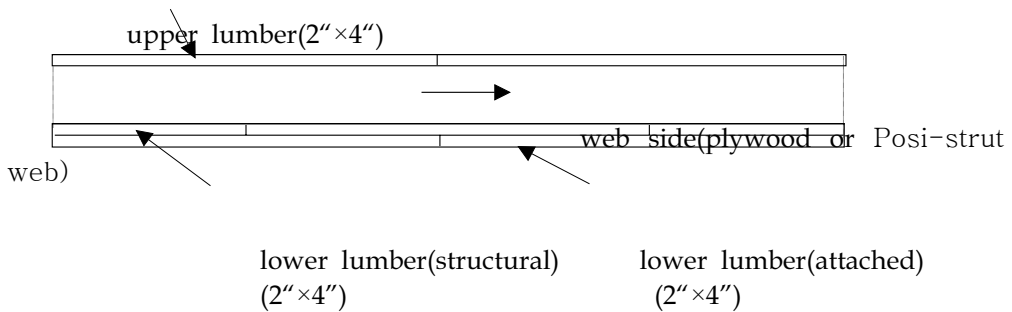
floor joist connection of light-frame wood structure by Korean softwood structural lumber
